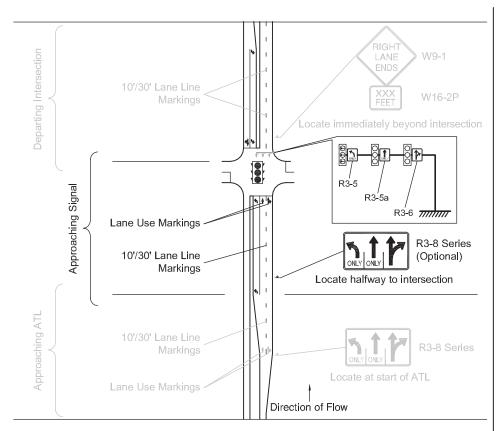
Signing and Pavement Markings for Approaching Signal Segment
